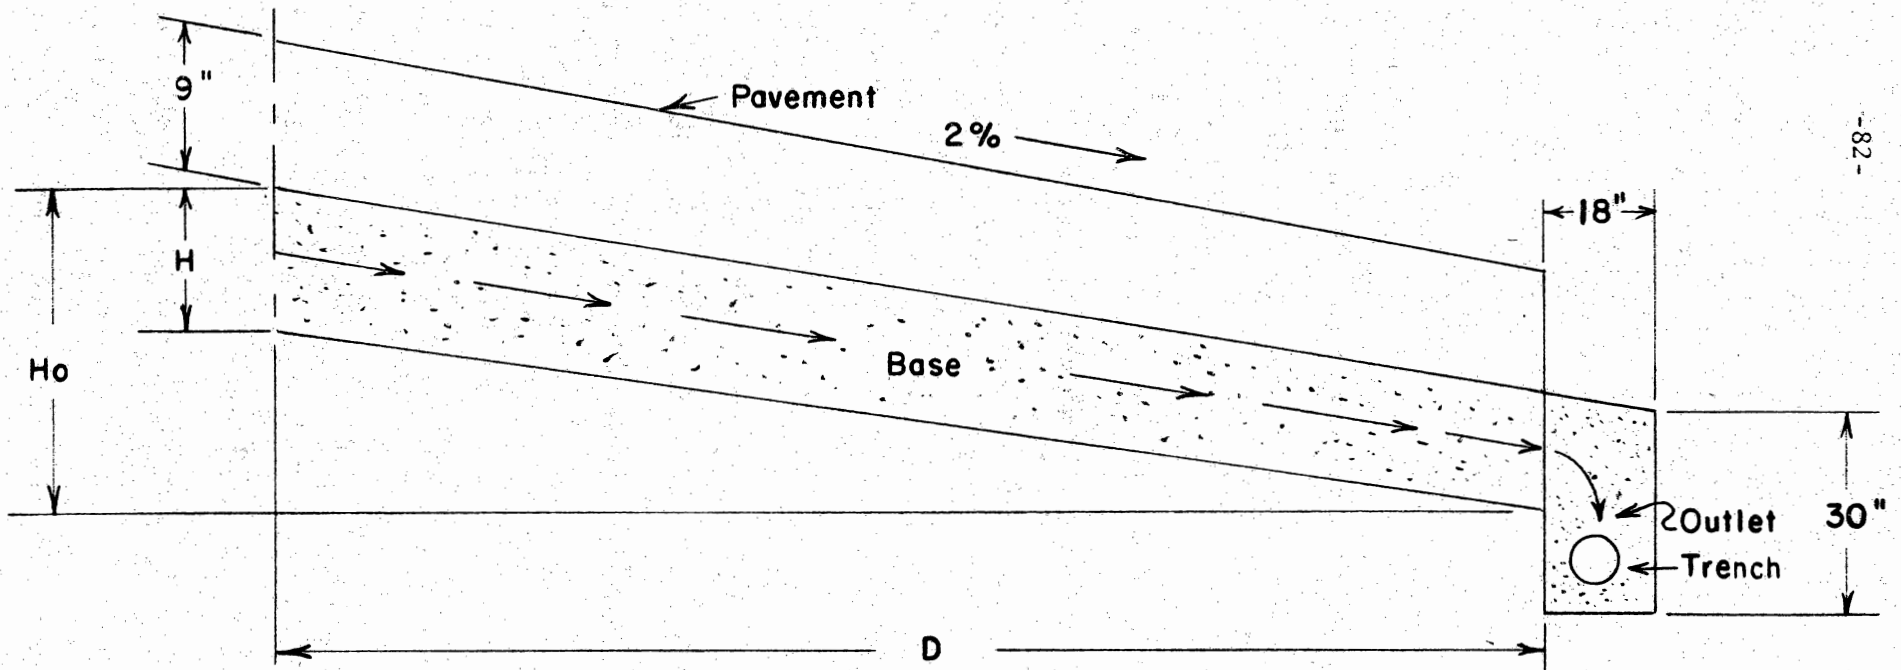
SCHEMATIC OF PAVEMENT CROSS-SECTION WITH SUBDRAINAGE SYSTEM.
